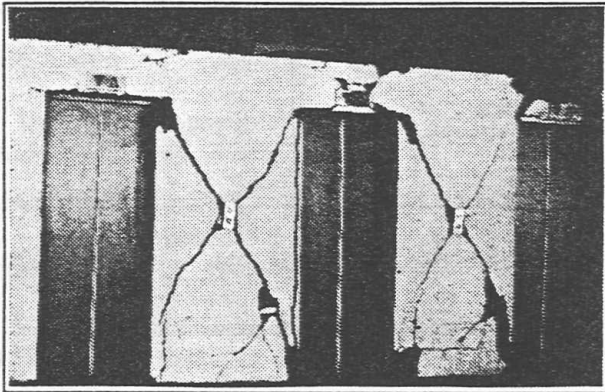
Typical X-type failure on the fill-in walls of an elevator shaft in a building damaged during the Mexican earthquake of 1979.
